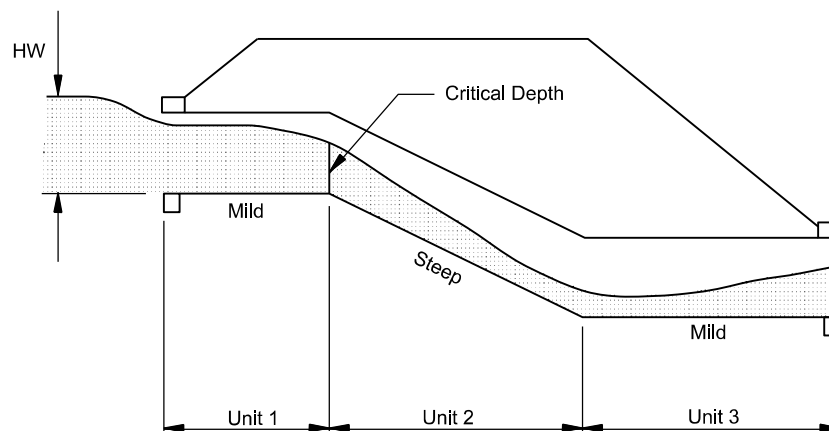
A — THREE-UNIT BROKEN-BACK CULVERT
